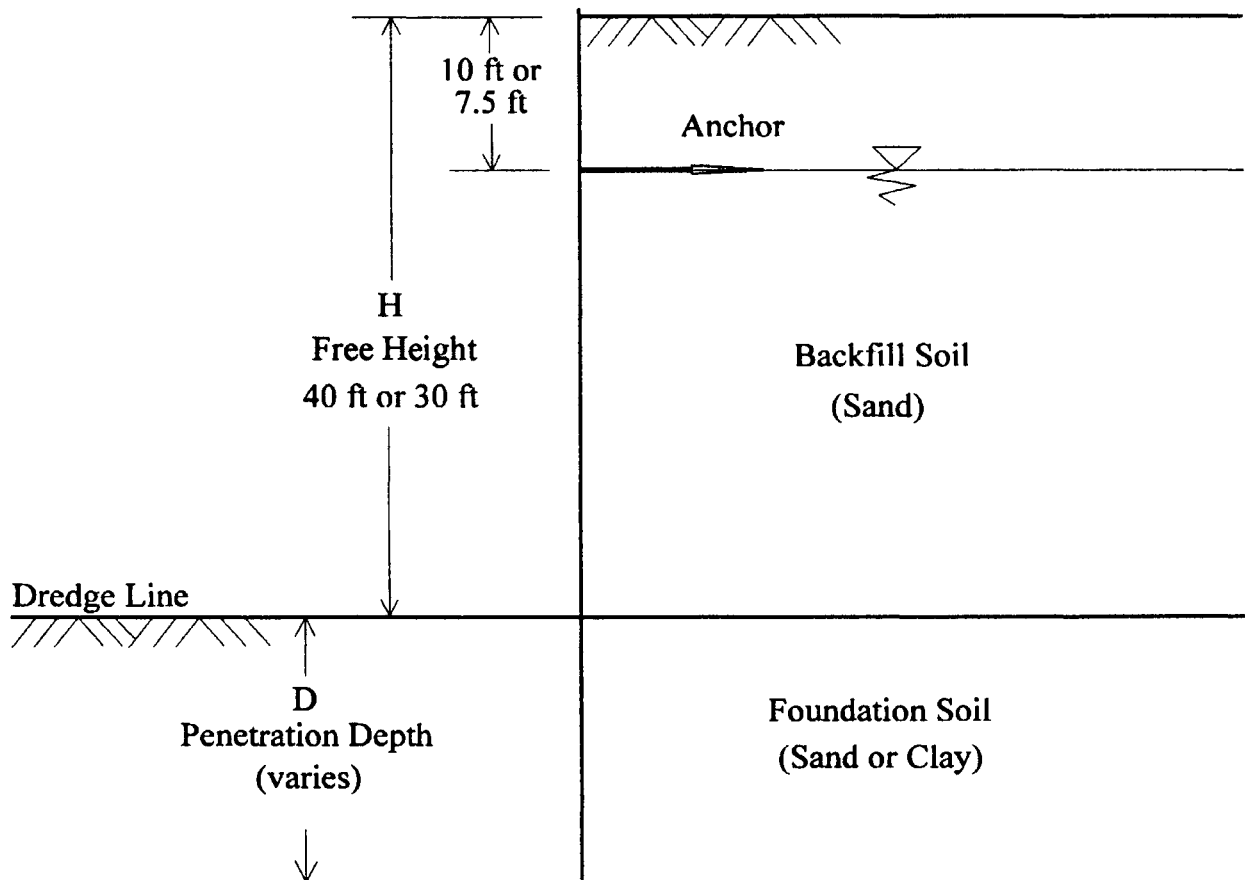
Typical Anchored Sheet Pile Wall Section Analyzed in This Study
